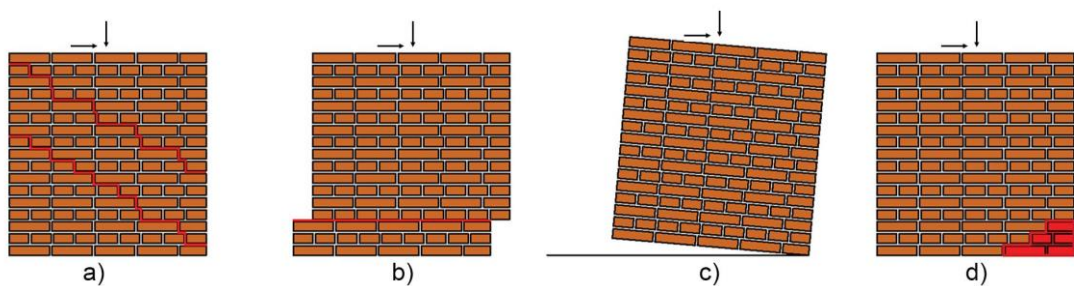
Failure modes of in-plane loaded URM walls: (a) shear failure; (b) sliding failure; (c) rocking failure; and (d) toe crushing failure (Reproduced after [108]).
